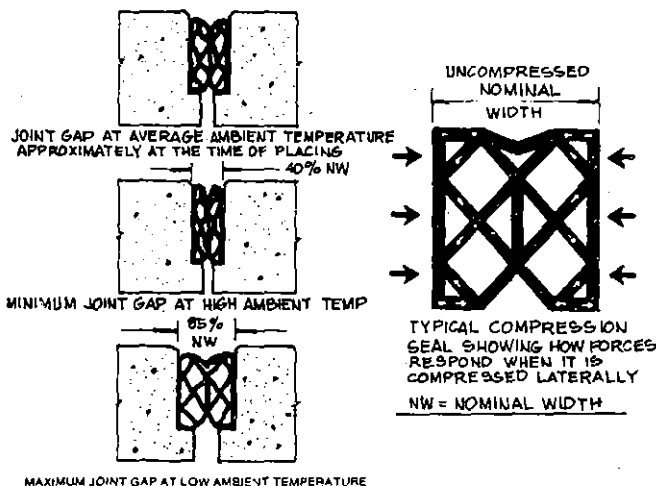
Compression seals are always in stressed state. They maintain watertightness and keep out incompressibles by maintaining sidewall pressure on the joint interfaces
